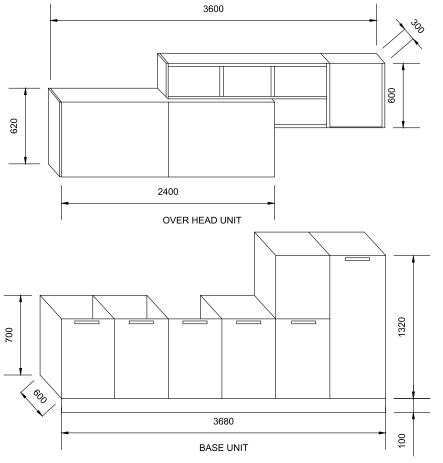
Layout Plan of Straight Line Kitchen
